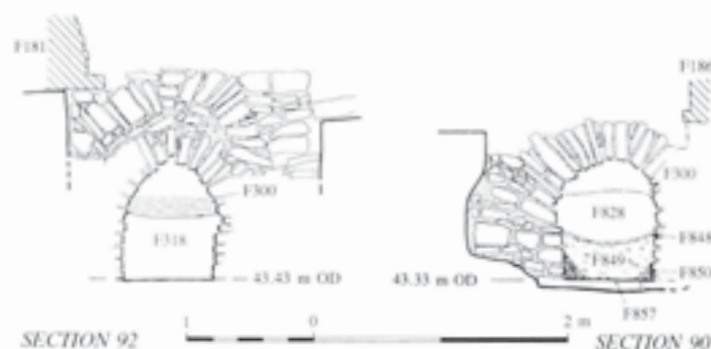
Cross-sections through the early thirteenth-century conduit and its construction trench in Areas 4 and 5. Scale 1:60
